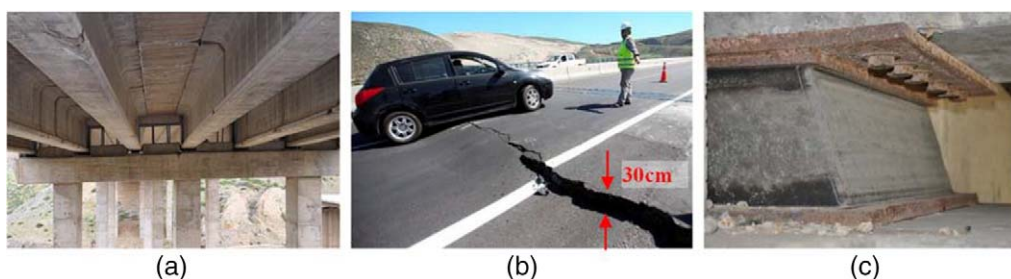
(a) Concrete girders and piers of El Teniente bridge, (b) south approach before temporary repairs, (c) deformed neoprene bearings on the south abutment. (30.995°S , 71.631°W).
